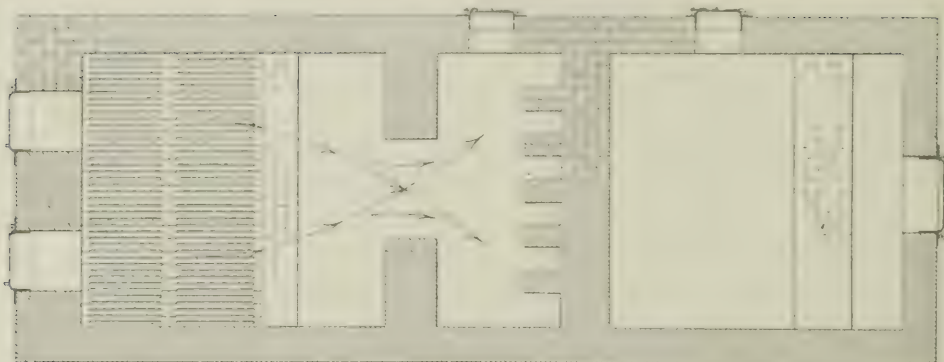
PLAN SHOWING KENT'S WING WALL FURNACE.
